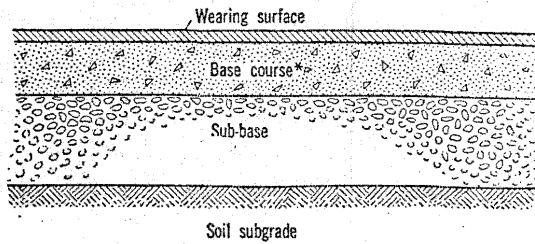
Typical Flexible Pavement Section
